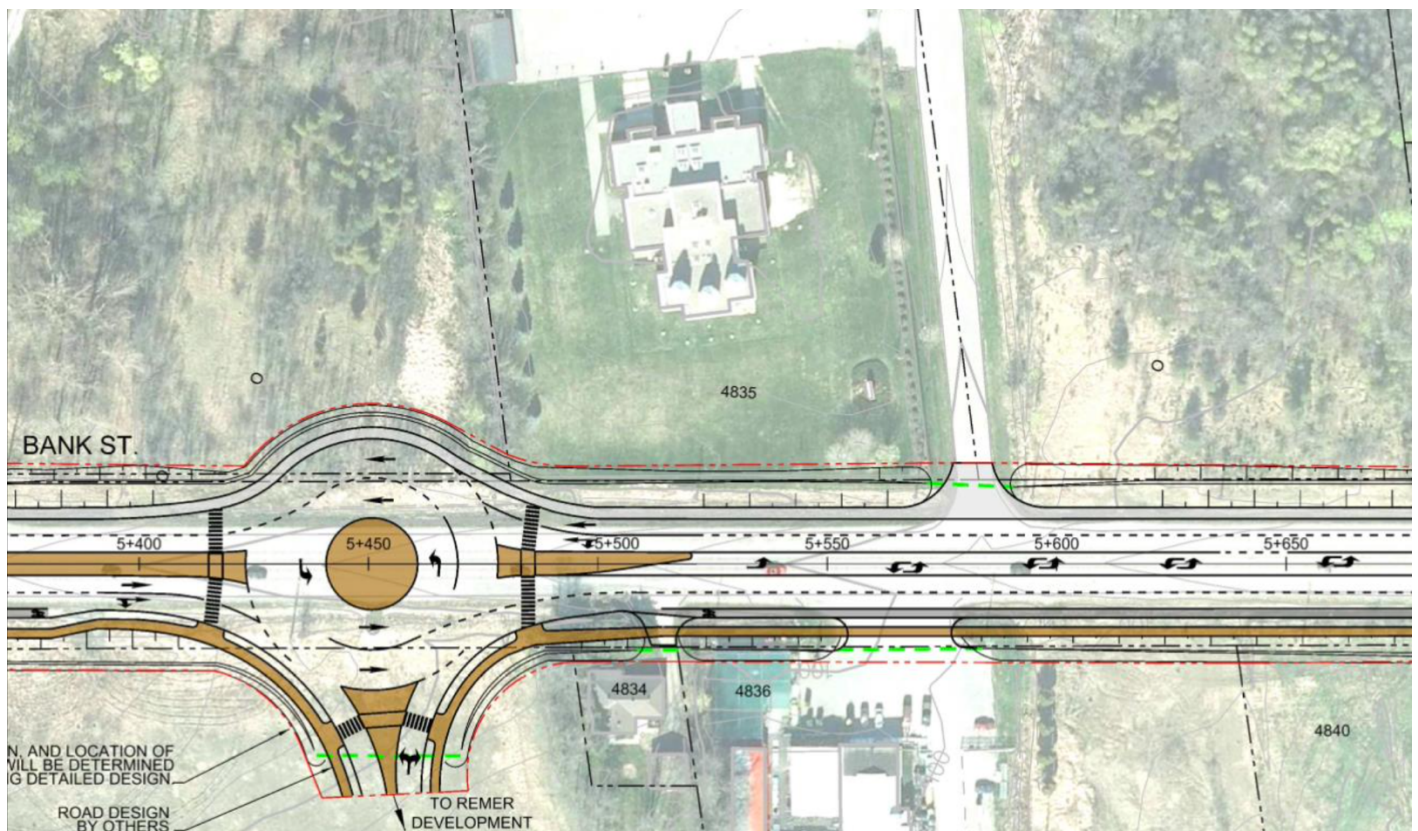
Schematic of proposed Bank Street widening (Bank Street EA 2014)
